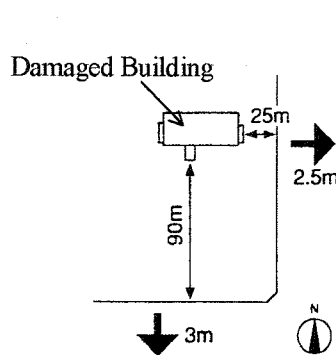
Map showing Damaged Building and Quay Wall Displacement
